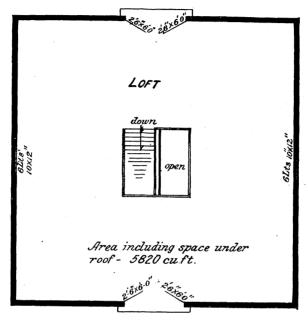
Loft plan of \$275 barn. (Design No. 2.)
